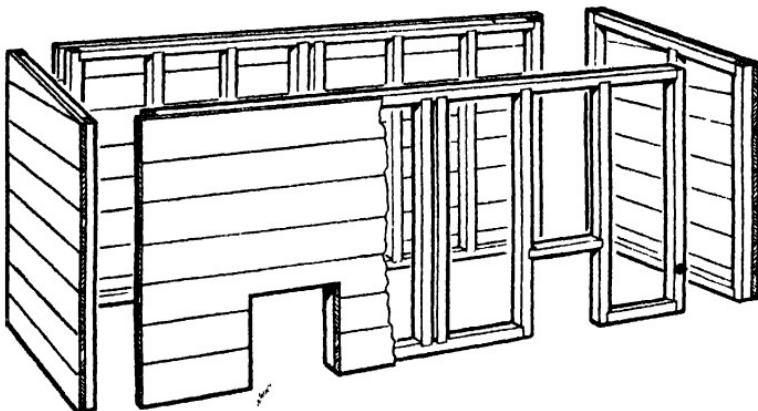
EXPLODED VIEW SHOWING FRAMES AND HOW THEY ARE BOARDED.
